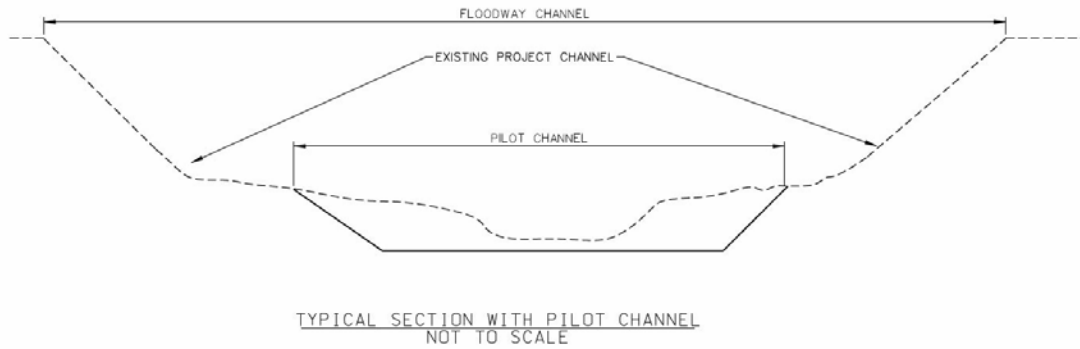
Typical Pilot Channel Cross Section for the Westside Creeks Recommended Plan
